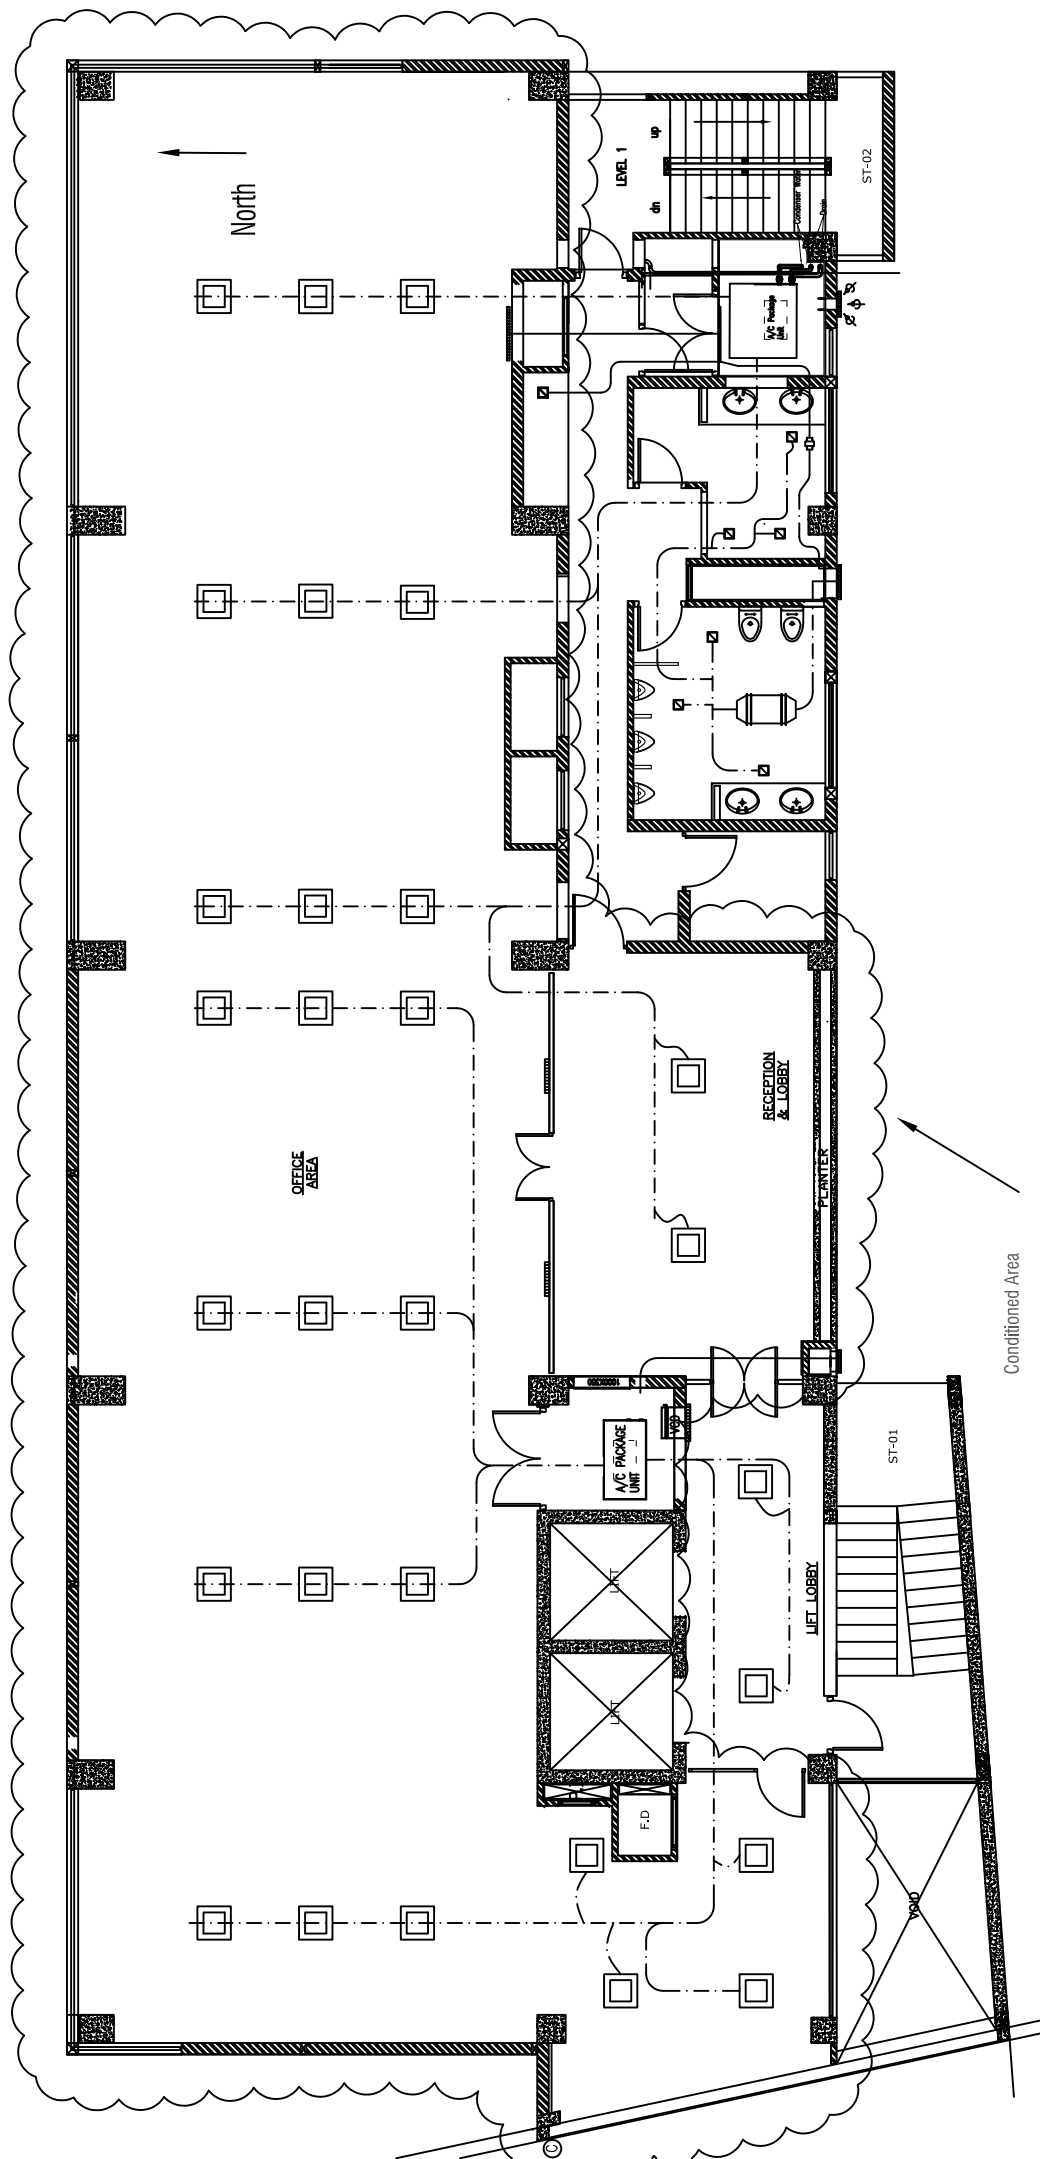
Ceylinco Life Insurance Building - 1 to 6 Typical Floor
